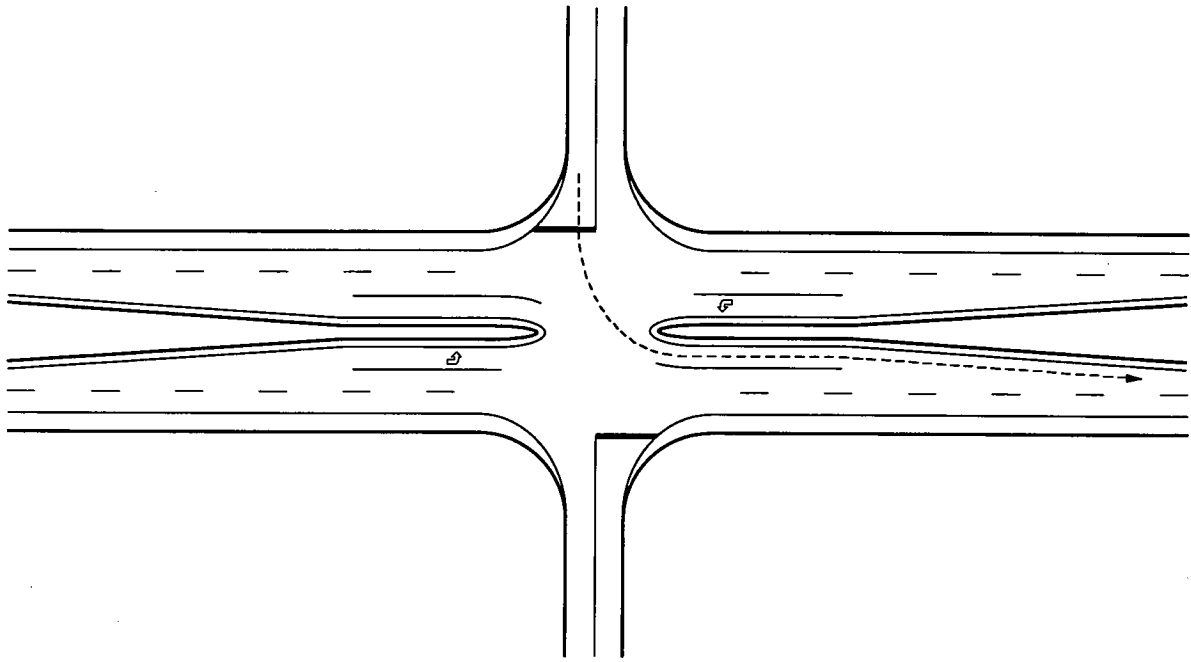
Typical four-leg divided highway intersection with median acceleration lanes.
